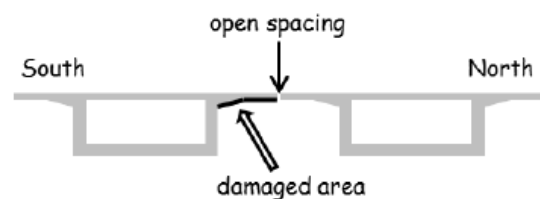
Cross section of the Neerbosche bridge indicating the damaged area and the open spacing between the northern and southern bridge.
